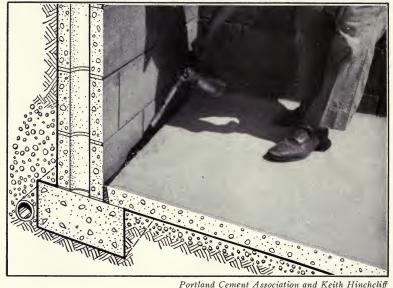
Details of footing, foundation, drain tile, floor, and waterproofed joint.
